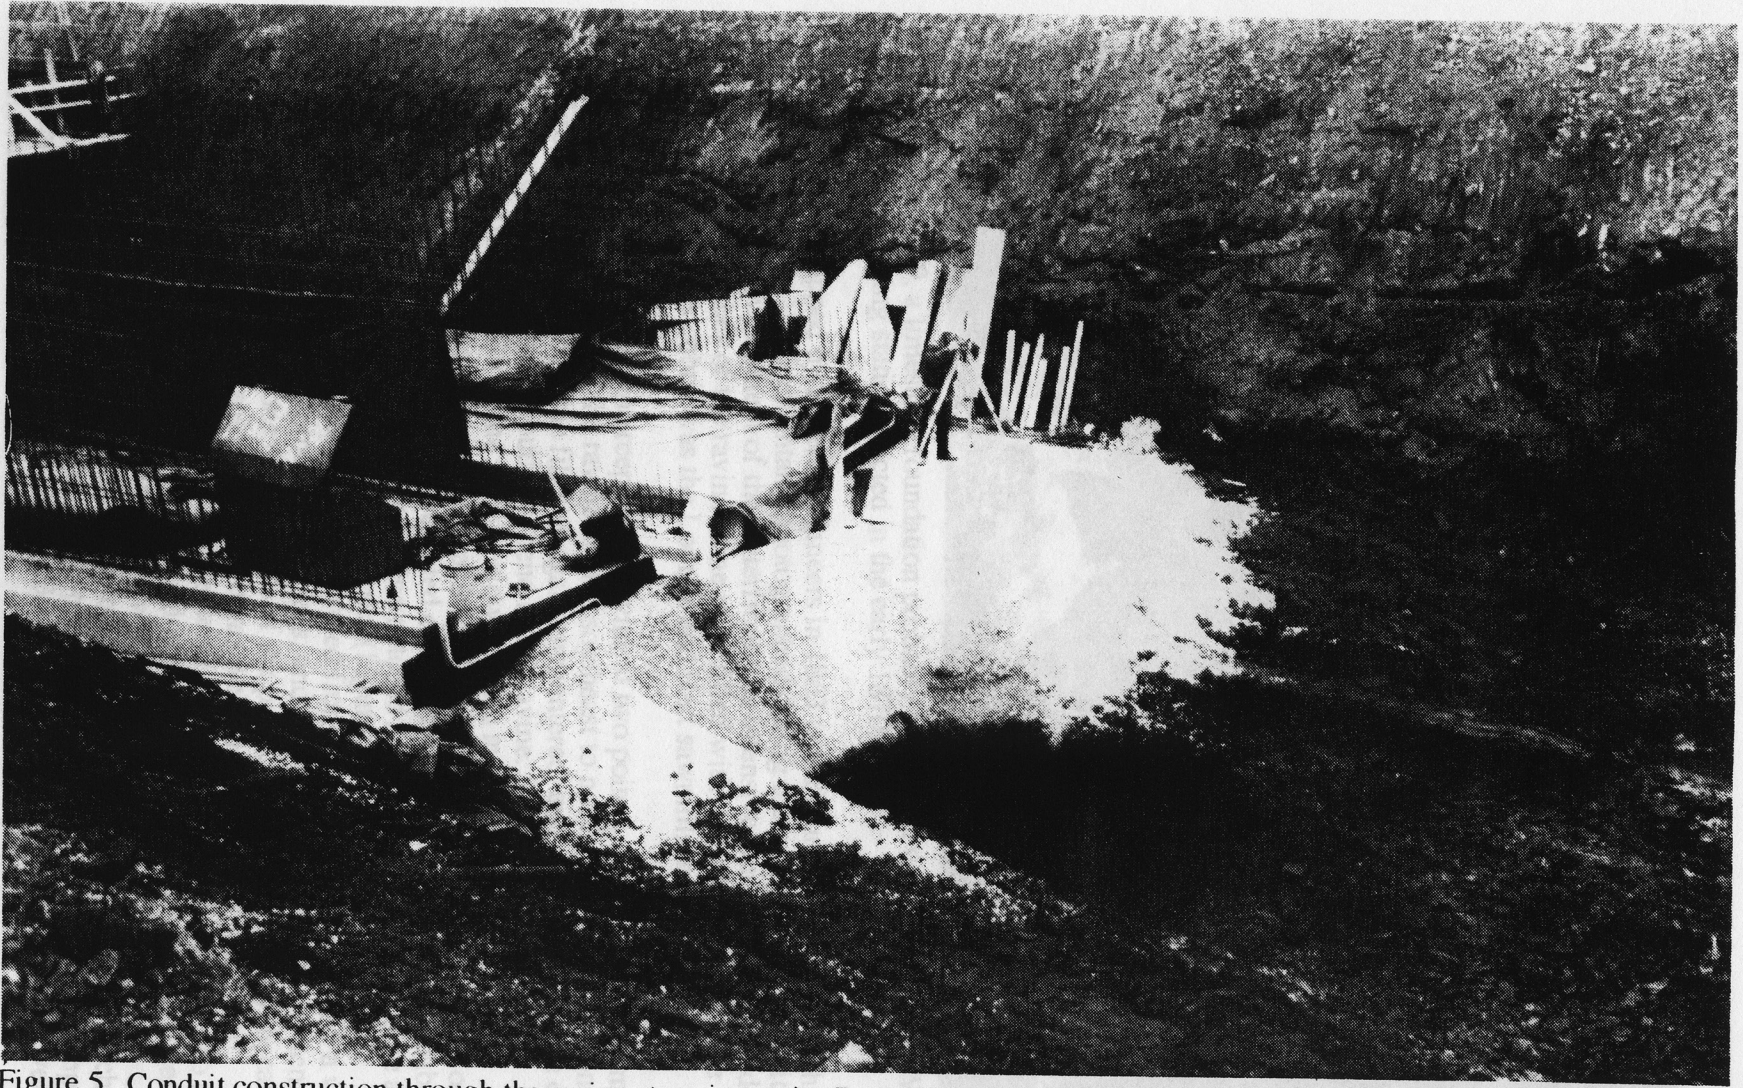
Conduit construction through the ravine at project point 7+00. At this point, the conduit trenching exposed several features in the ravine filled with wood by-products, including an enigmatic wooden trough or wall, and a limestone foundation of probable antebellum origin.
